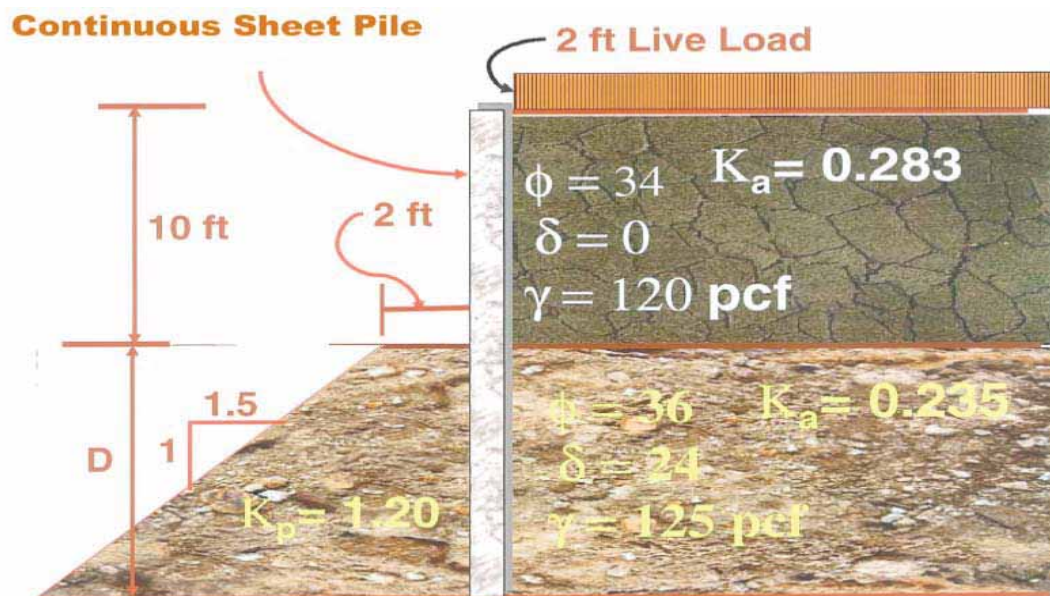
Example Problem of a Short Sheet pile Cantilever Retaining Wall
